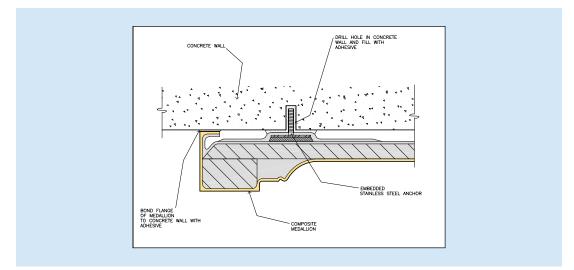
Section view: Internal support FRP panels attached to concrete substrate
